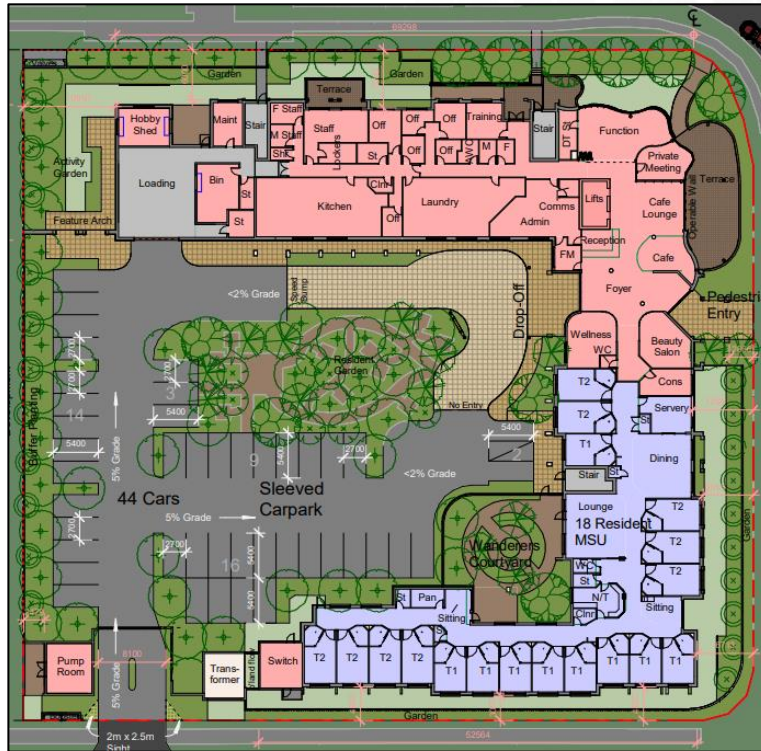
Rockpool proposal (adjoining the subject site to the east)- Level 1 showing extent of built form and central car parking hardstand
